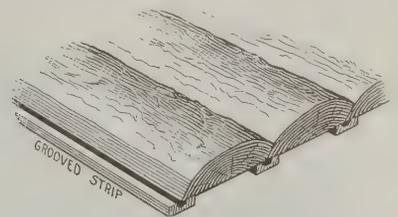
Arrangement of Roof Slabs with Grooved Strips Under the Joints
